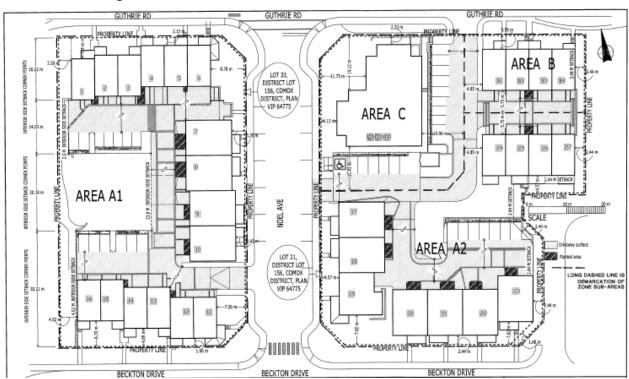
1245 and 1263 Guthrie Road Sub-Areas and Setbacks
